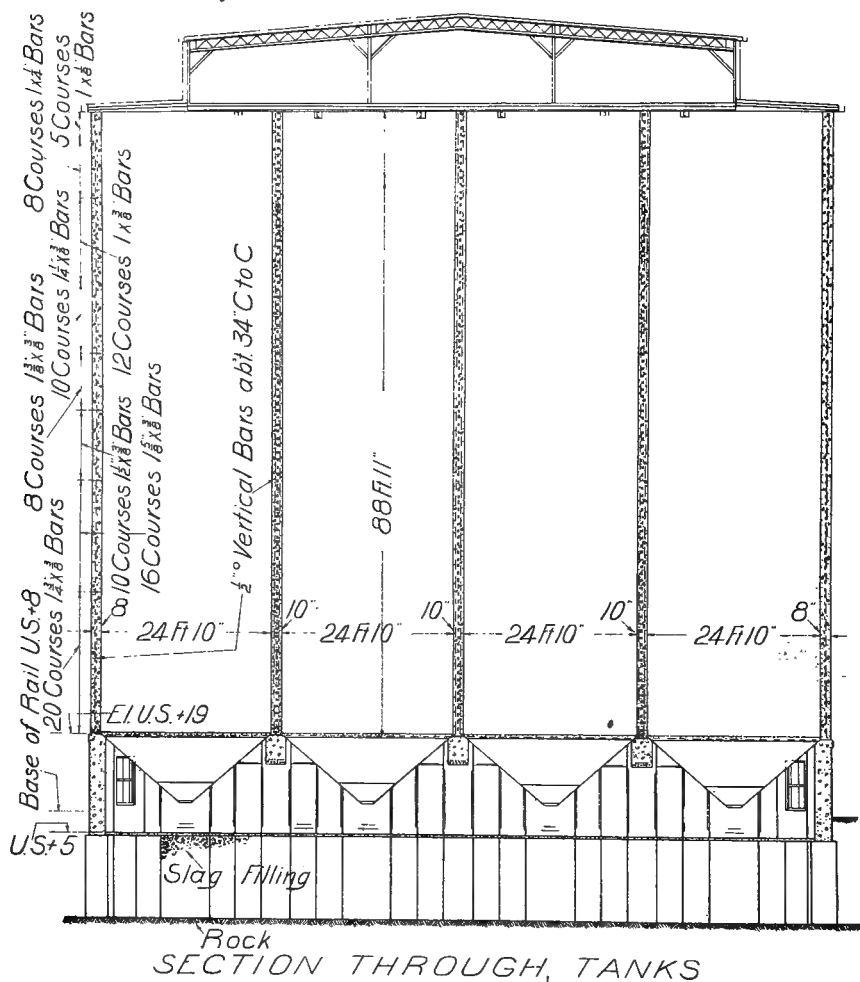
CROSS SECTION OF TYPICAL REINFORCED CONCRETE GRAIN ELEVATOR.
